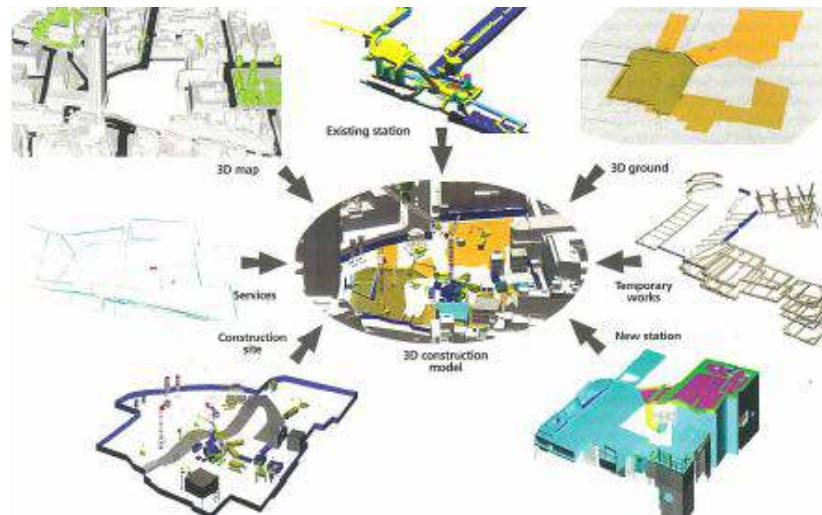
3D presentation of Tottenham Court Station with the building, existing station, ground model, temporary works and site facility overlays.
